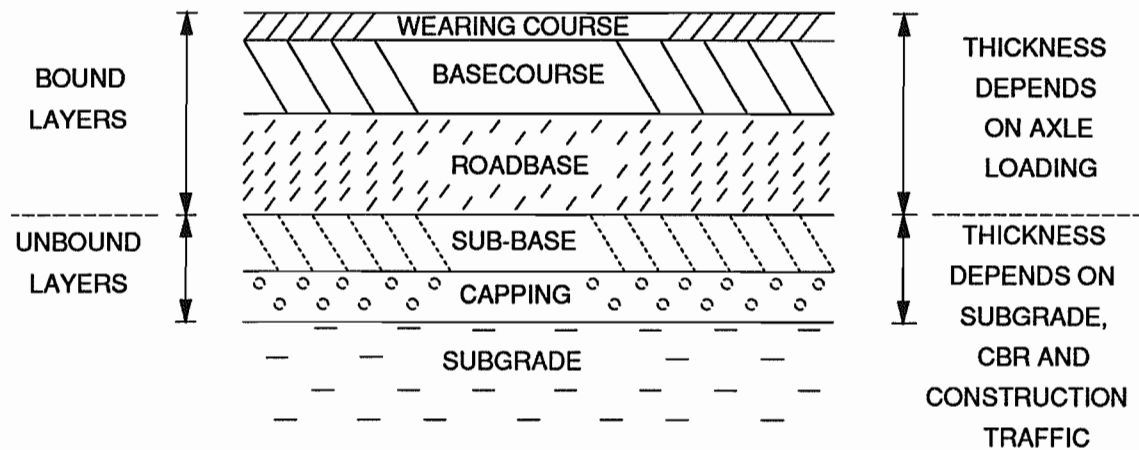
Road pavement structure (after Biczysko, 1989)
